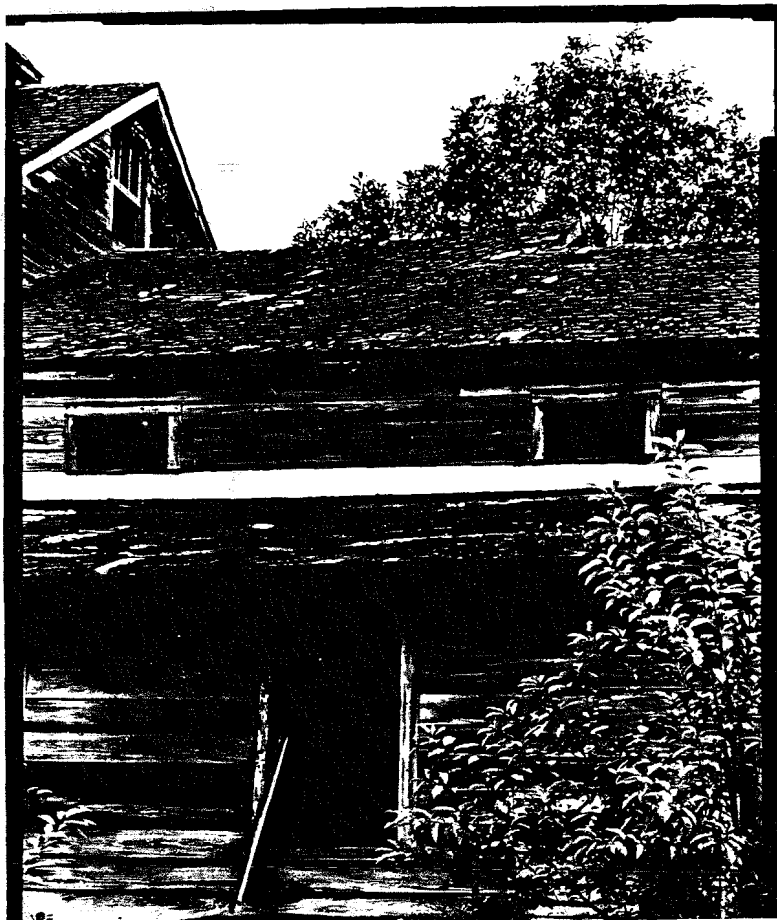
DUCK CREEK MILL, SOUTHWEST ELEVATION
